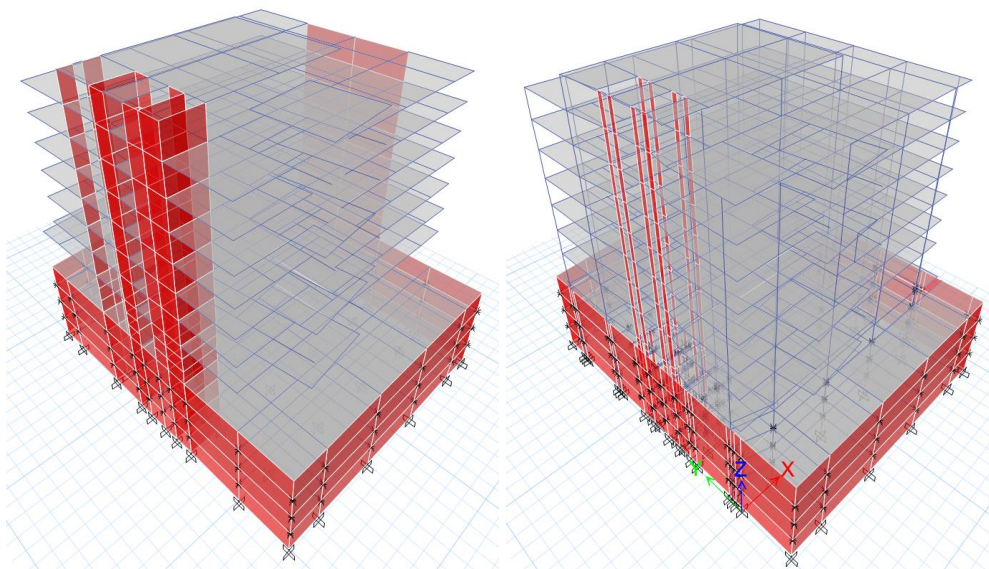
Office Building: (left) Structural Wall System; and (right) Seismically Isolated System.
